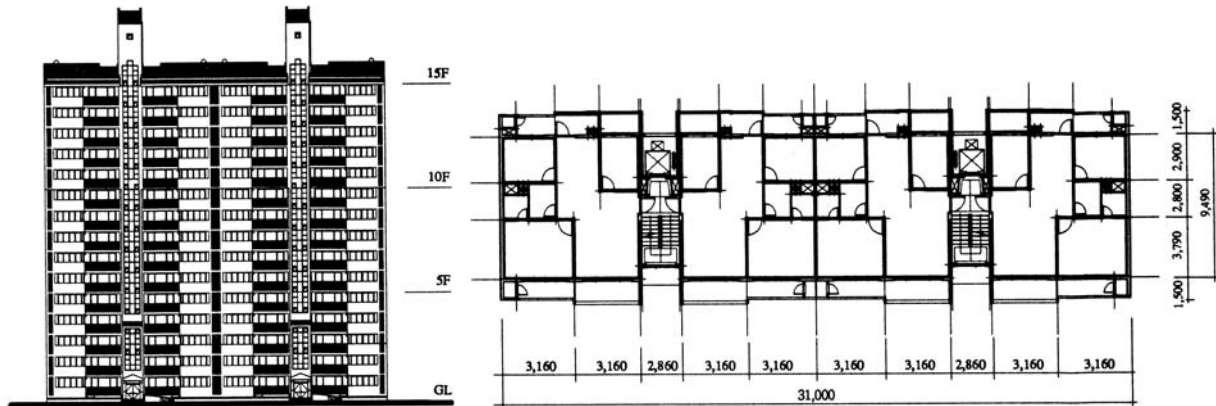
ELEVATION AND PLAN VIEW OF TWO MODULE UNIT
